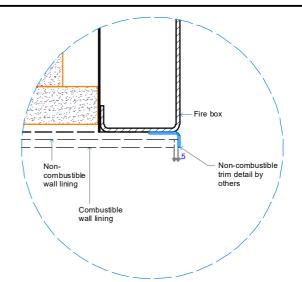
Plan View Fire Surround Opt. 1 Timber Cavity
